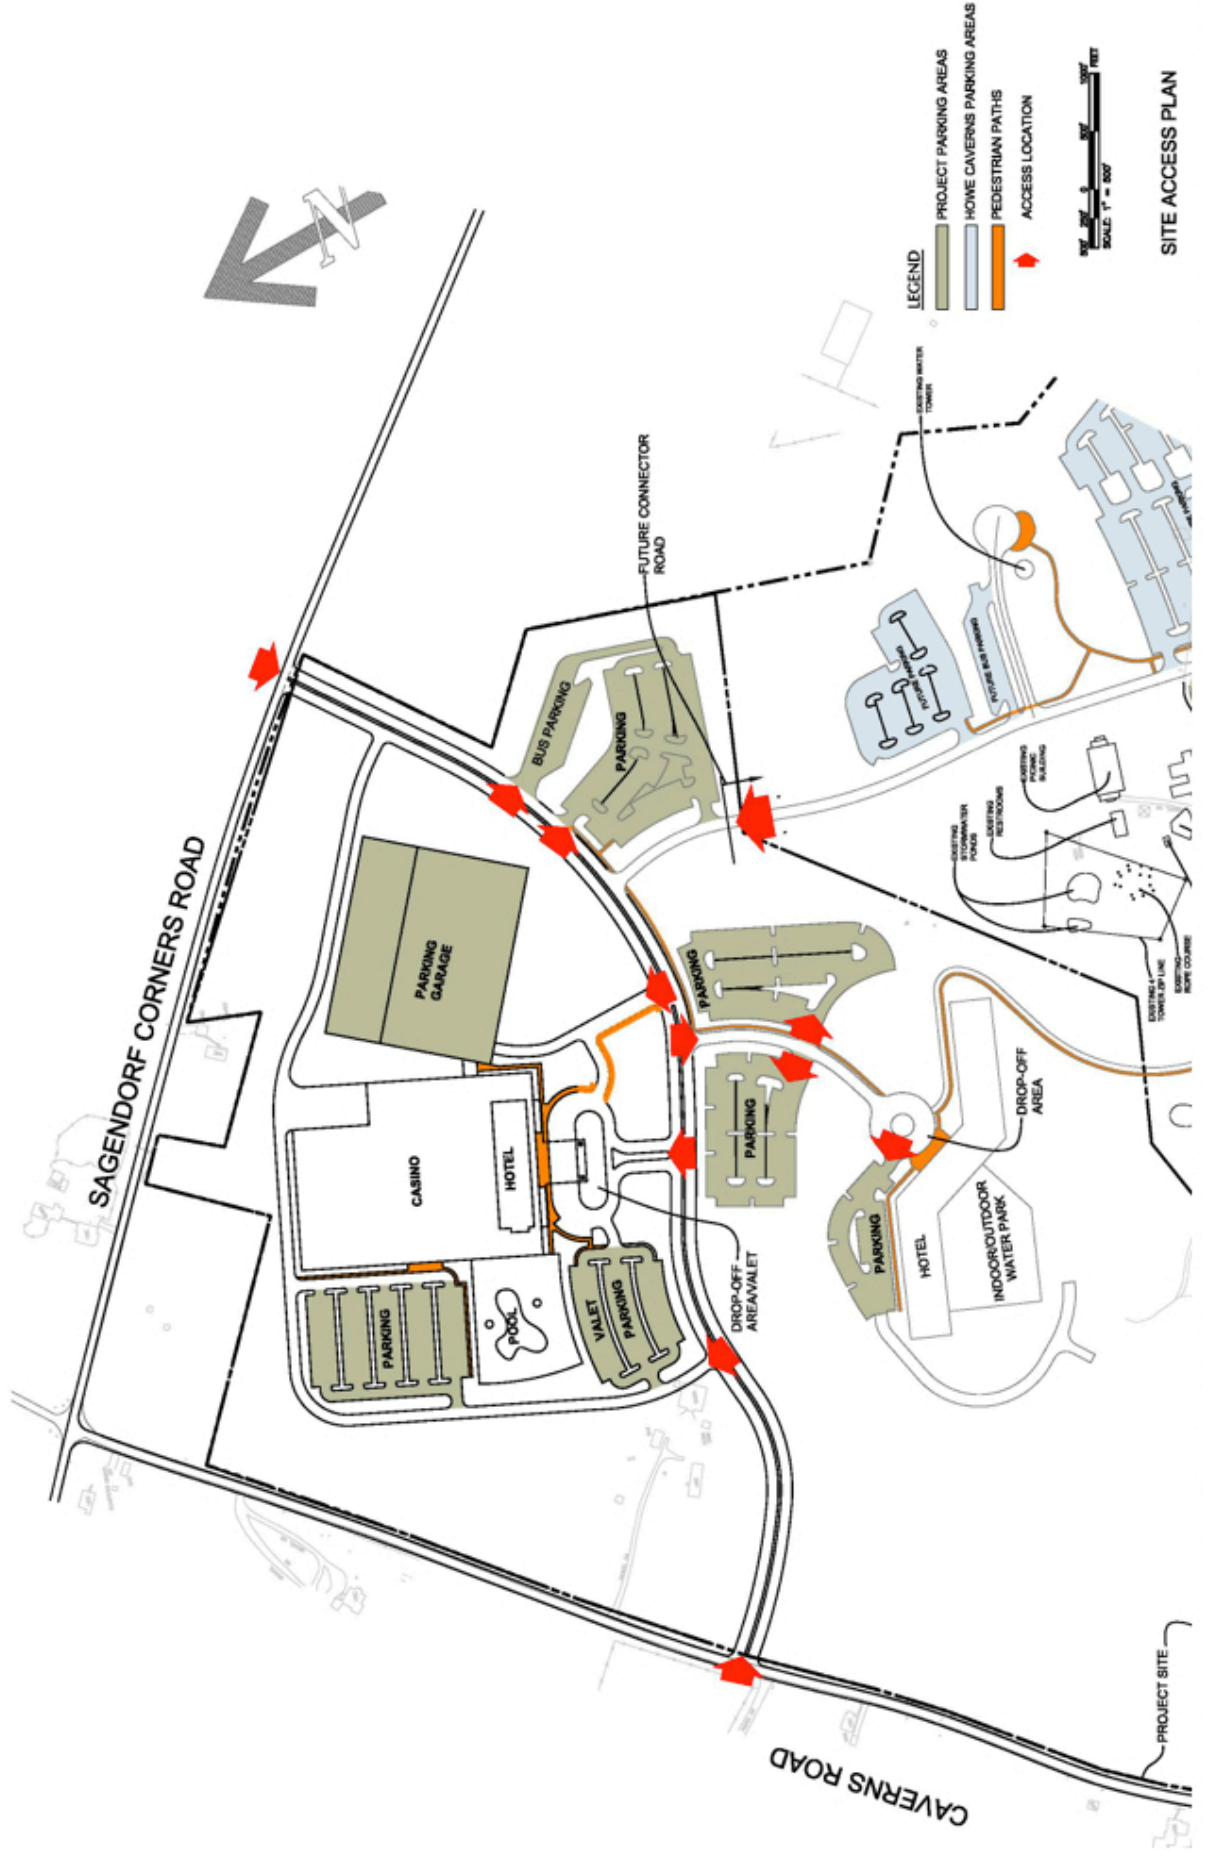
b. Overall Architectural and Building Plan
